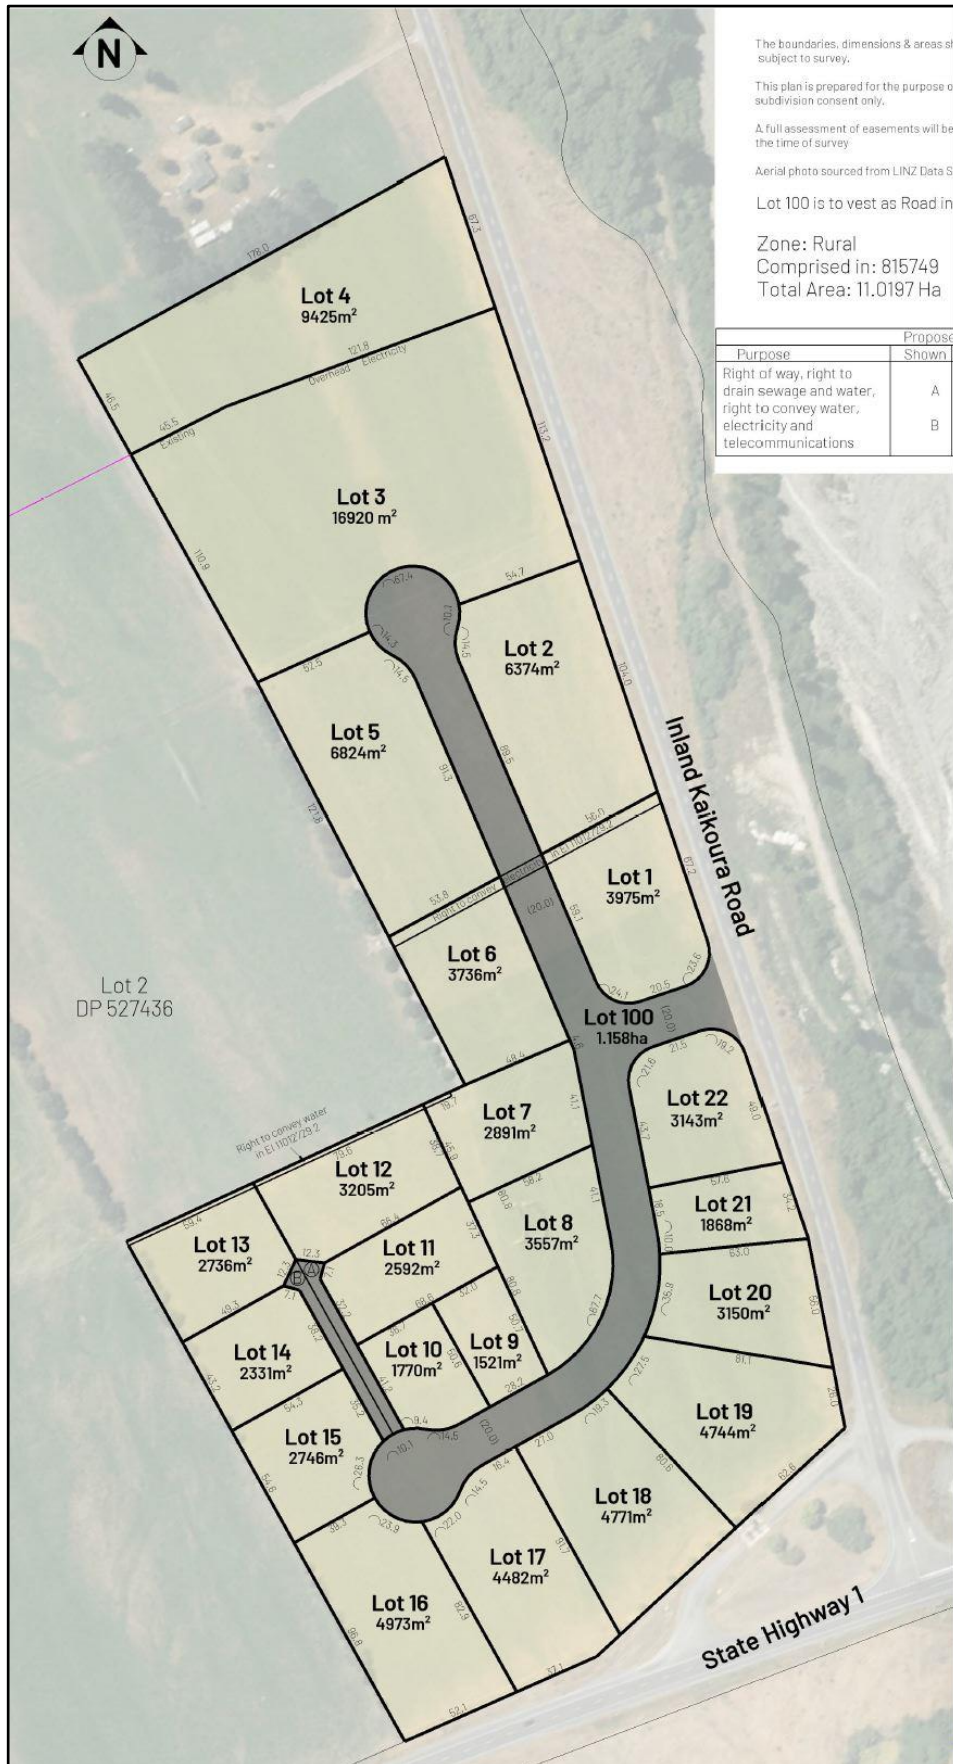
Plan showing the proposed layout of the commercial subdivision to be formed out of Lot 2 DP 501321. Image: Baseline Group Ltd.
